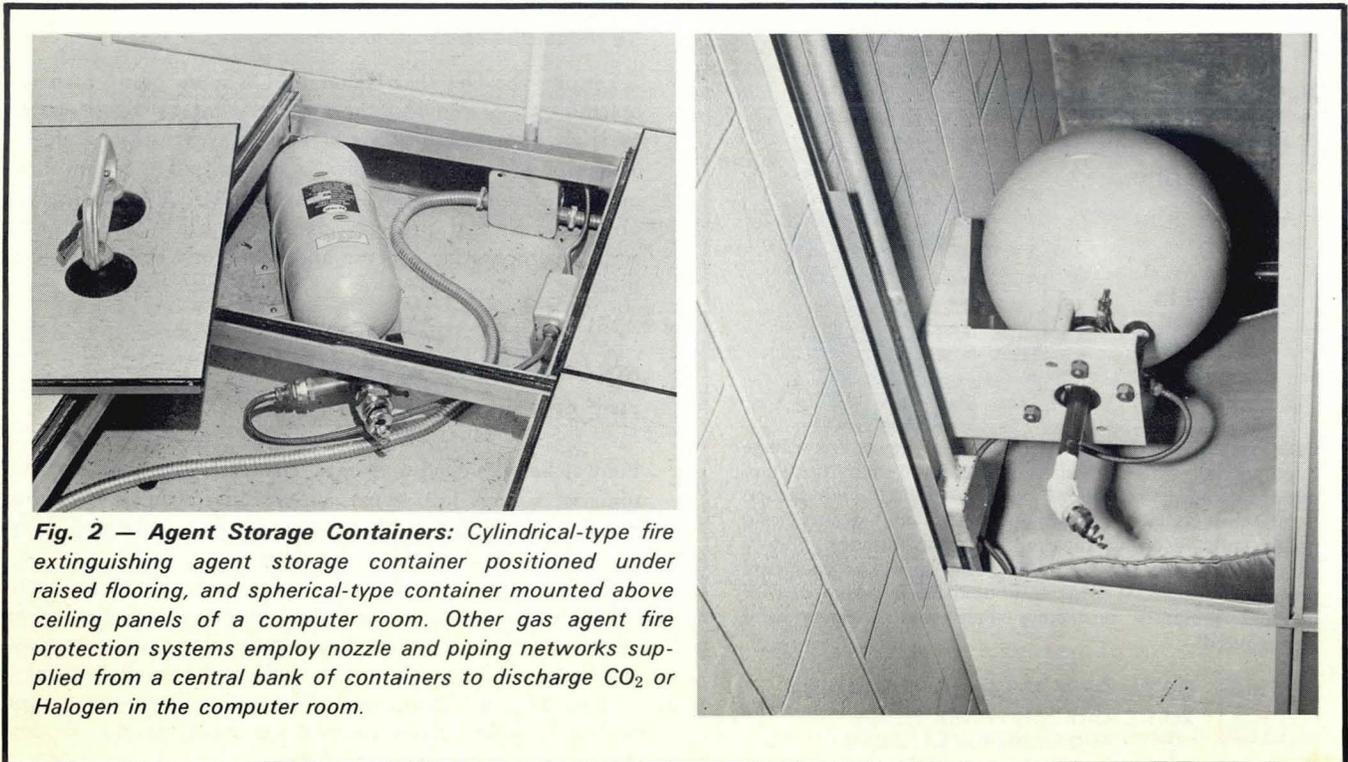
Agent Storage Containers: Cylindrical-type fire extinguishing agent storage container positioned under raised flooring, and spherical-type container mounted above ceiling panels of a computer room. Other gas agent fire protection systems employ nozzle and piping networks supplied from a central bank of containers to discharge CO₂ or Halogen in the computer room.
